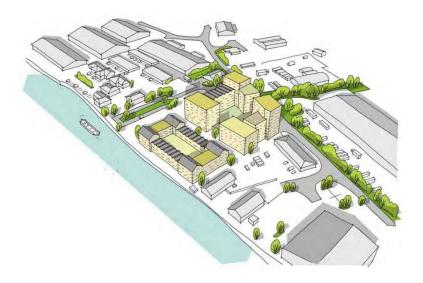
ILLUSTRATIVE MASTERPLAN OF SITE 2
